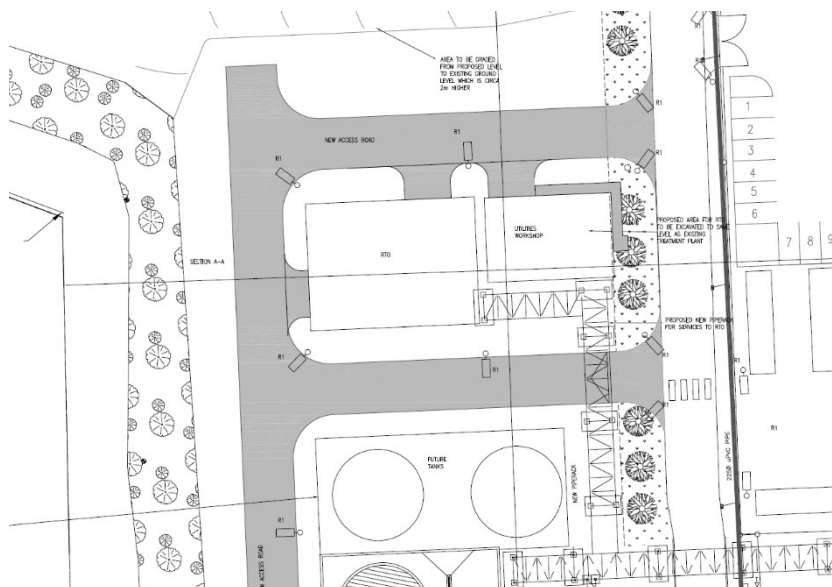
Plan View of Thermal Oxidiser, Utility Building & Piperack extension
